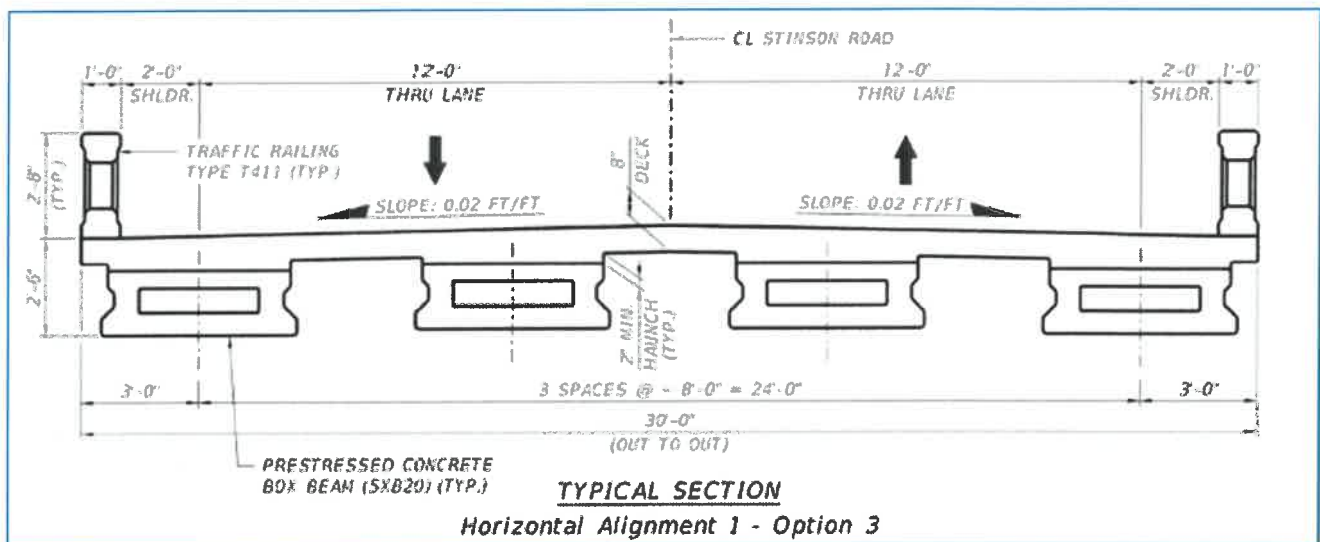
TxDOT Prestressed Concrete XBeams (5XB20) Typical Section
